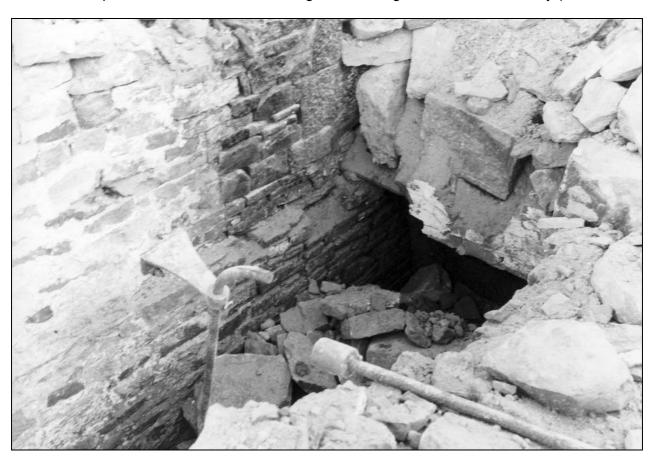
Wheelpit, as visible at start of watching brief, looking east (film 2, frame 2)
